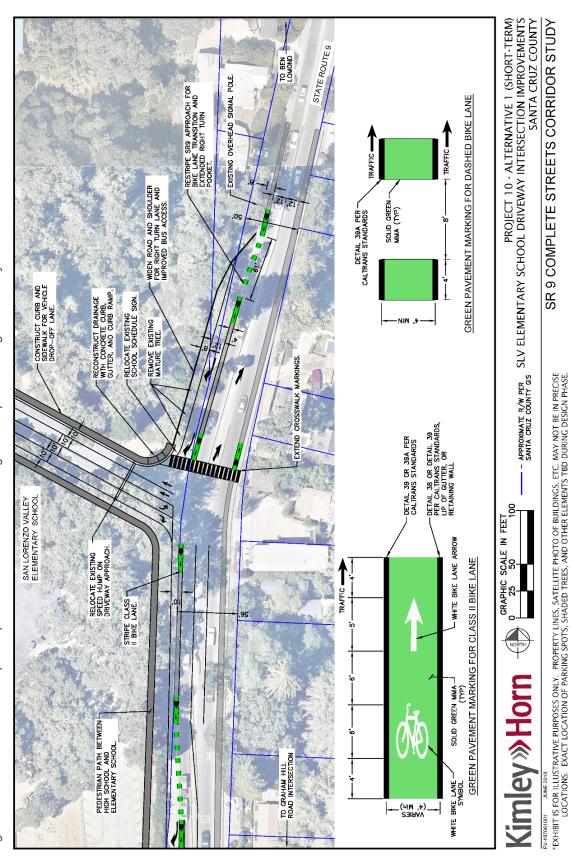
SLV Schools Campus Improvement Short-Term Design Concept - Existing Elementary School Entrance
